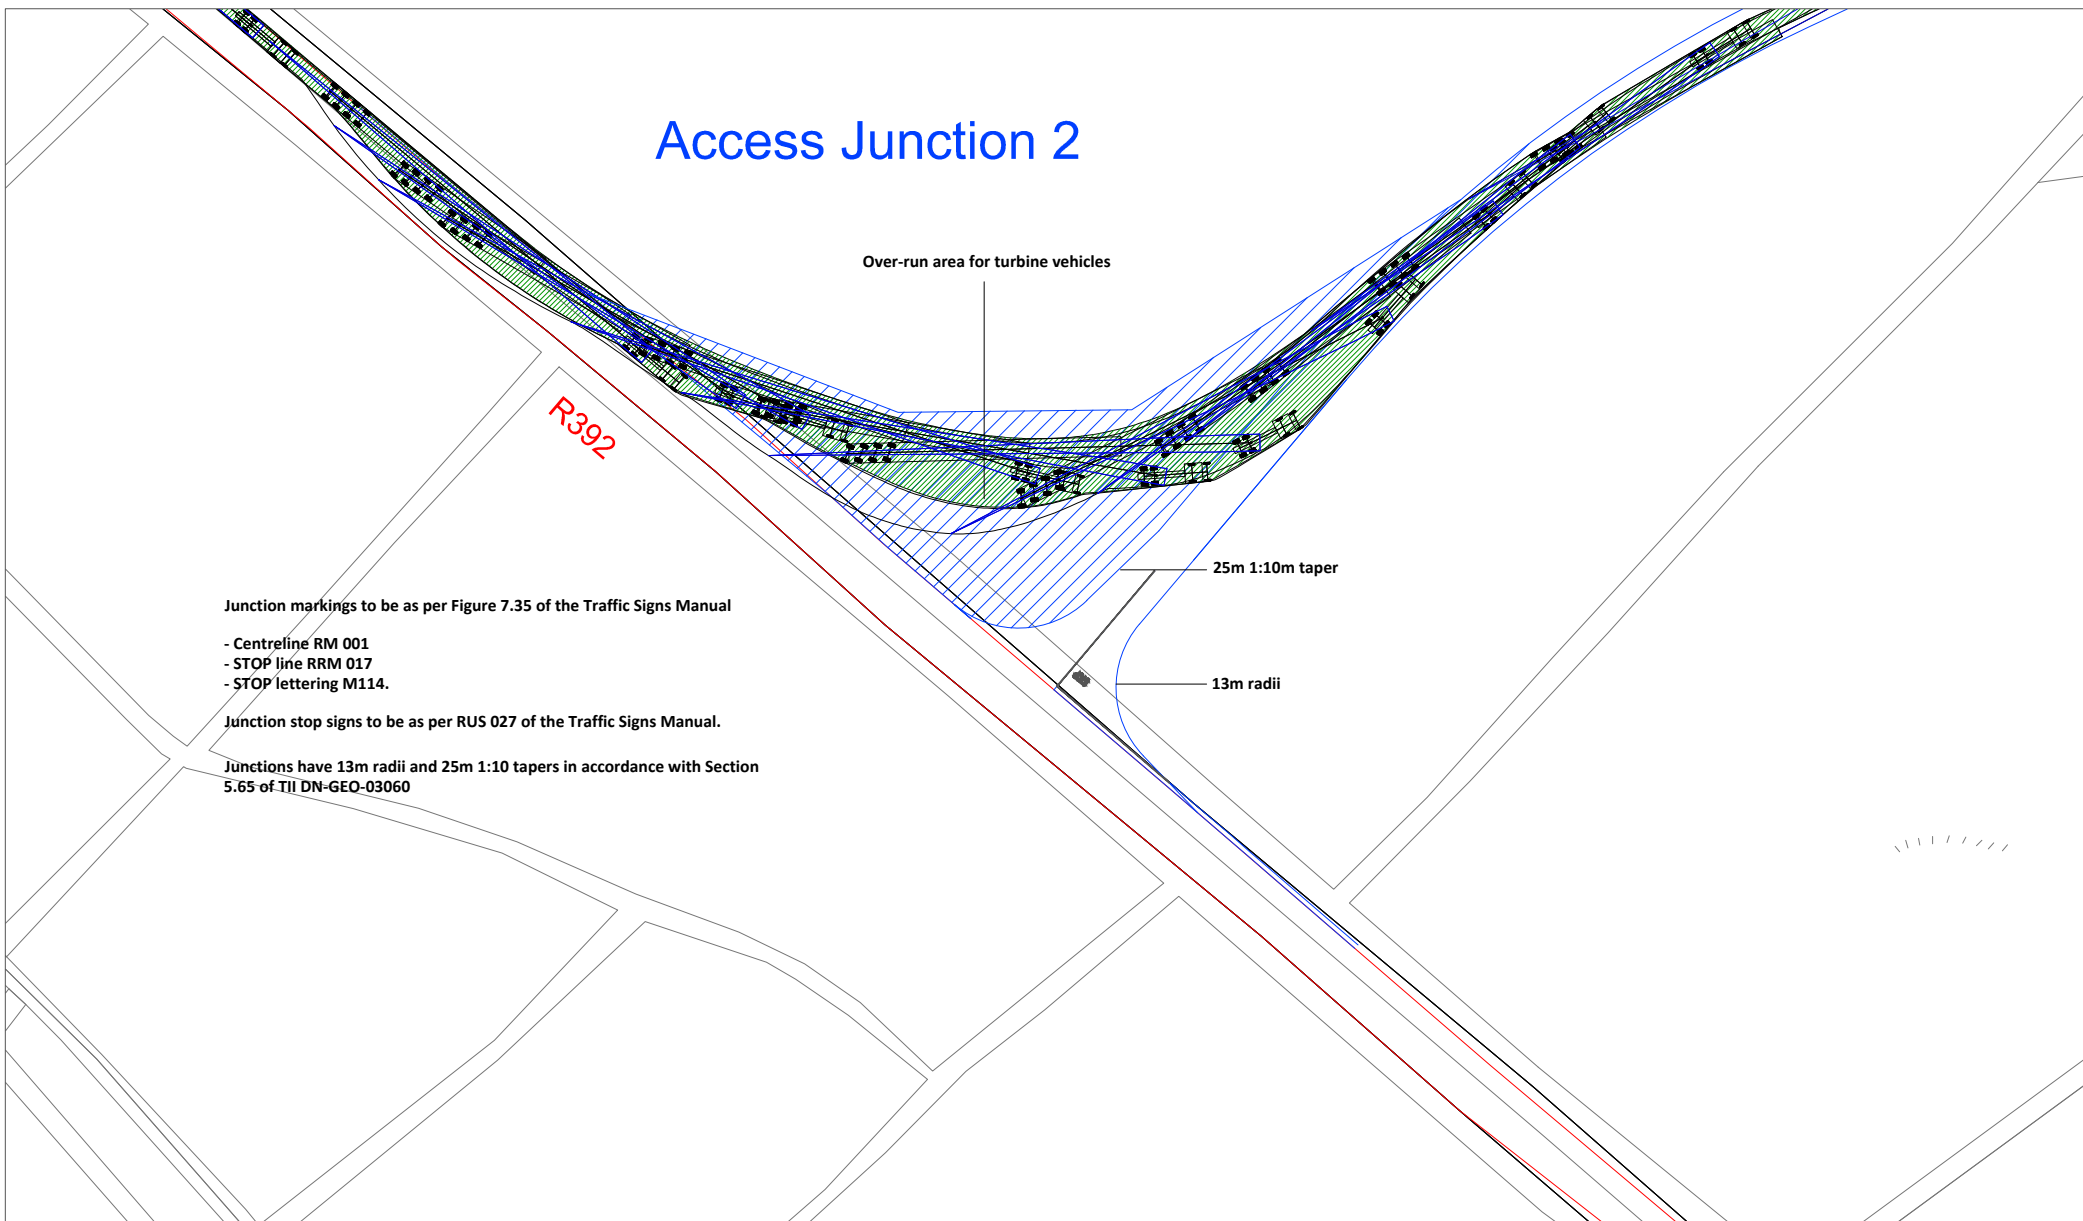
Access Junction 2 - R392 - Access for all construction traffic, proposed layout and visibility splay
